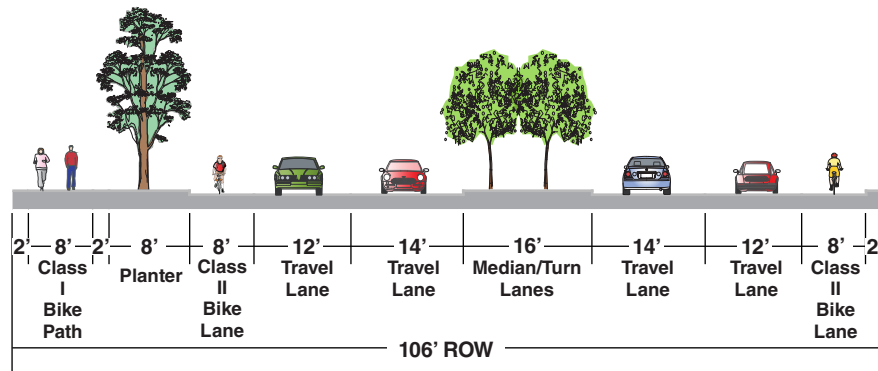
Eastside Parkway - Typical Four Lane Street Section
